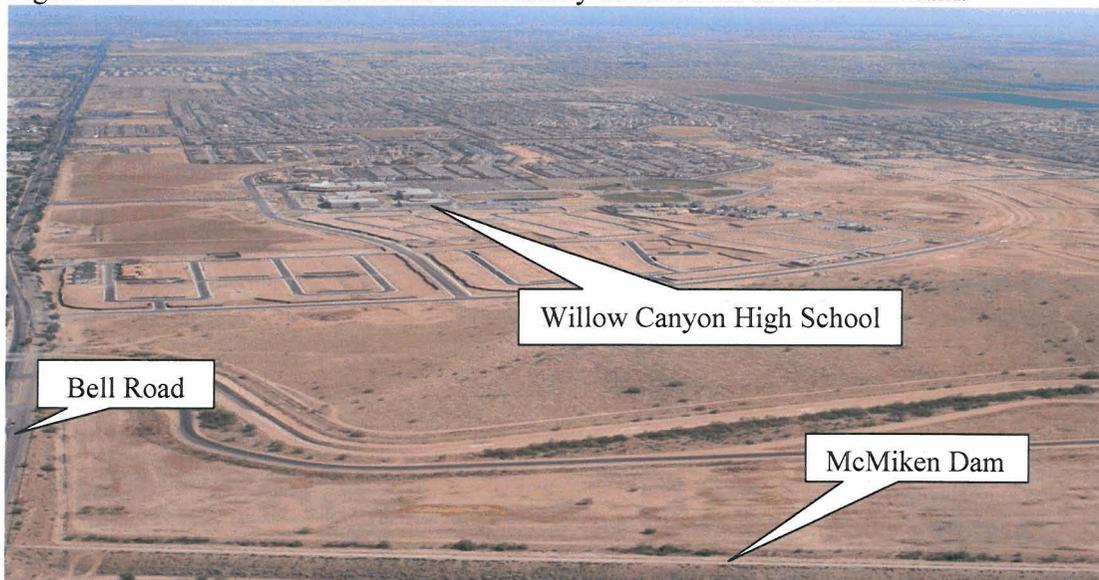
New Home Construction immediately downstream of McMiken Dam.
